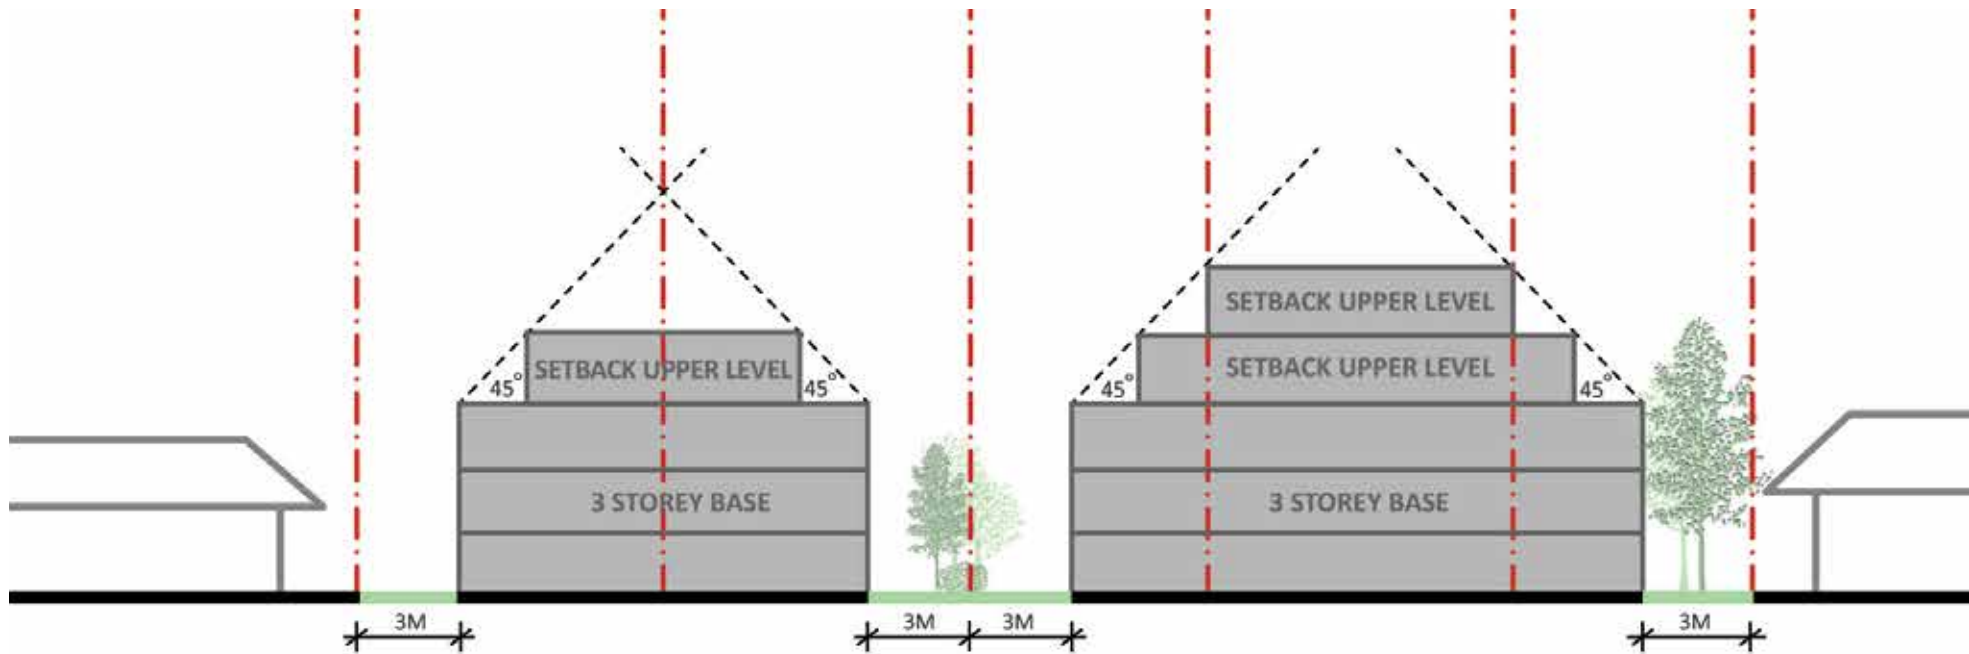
Front Elevation - Creekside - sharing side setbacks for 2-lots & 3-lot sites
